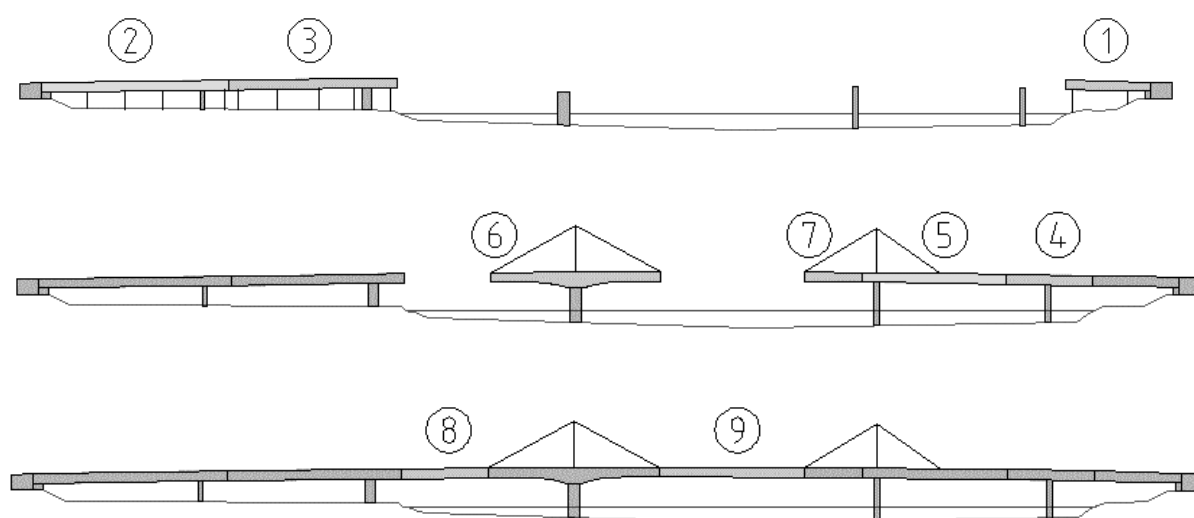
The nine construction phases concerning the erection of the cross-sections for the bypass bridges (Hausleitner, 2014)
